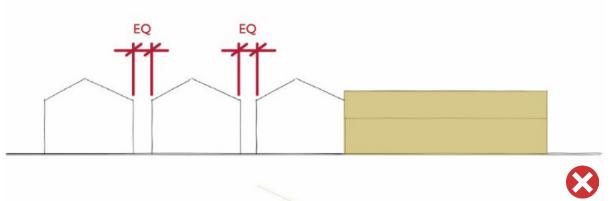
The new building on the right does not respect the existing pattern of space and side setbacks between adjacent contributing resources.
